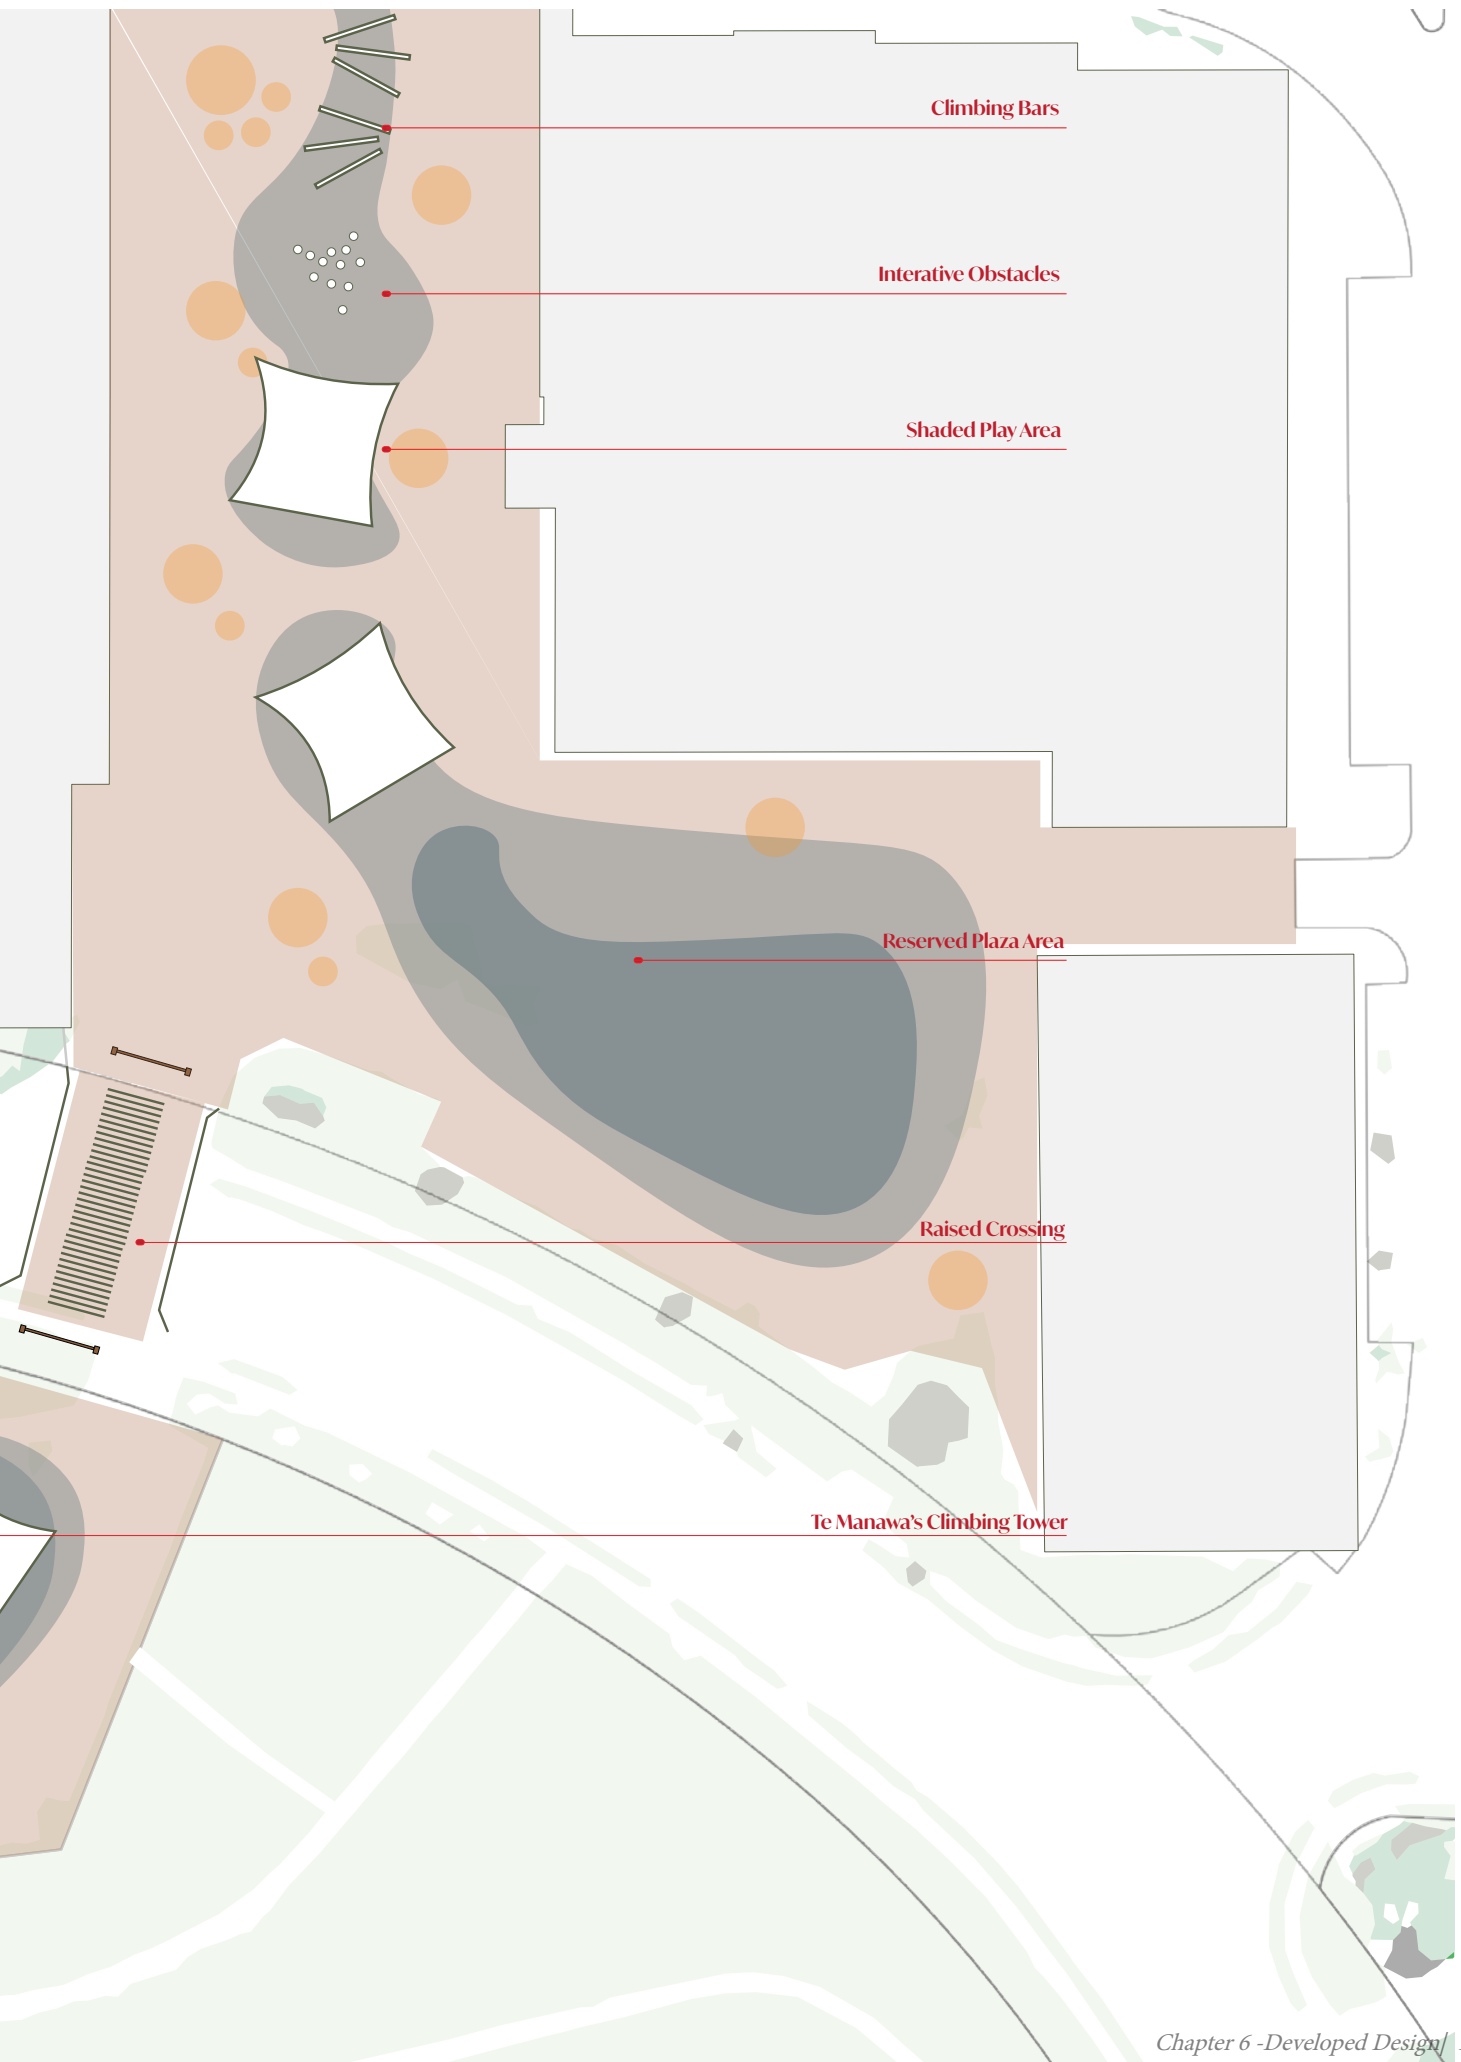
Playful Urbanism Site Plan Part B (2025), Authors Artwork
